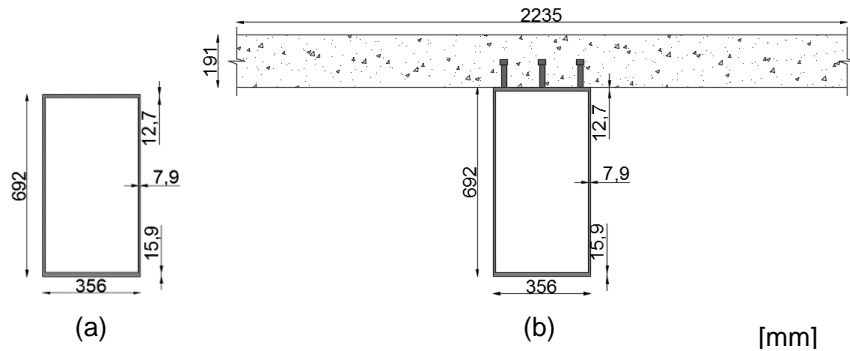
Cross-section G1, span 1&5, steel only (a) and composite (b) (dimensions in mm)
